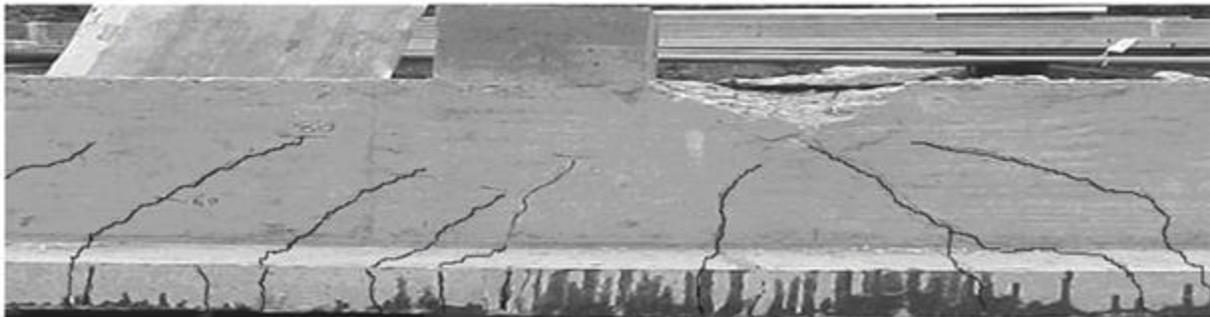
Final Failure in Beams by Crushing of Concrete (Beam B1)
